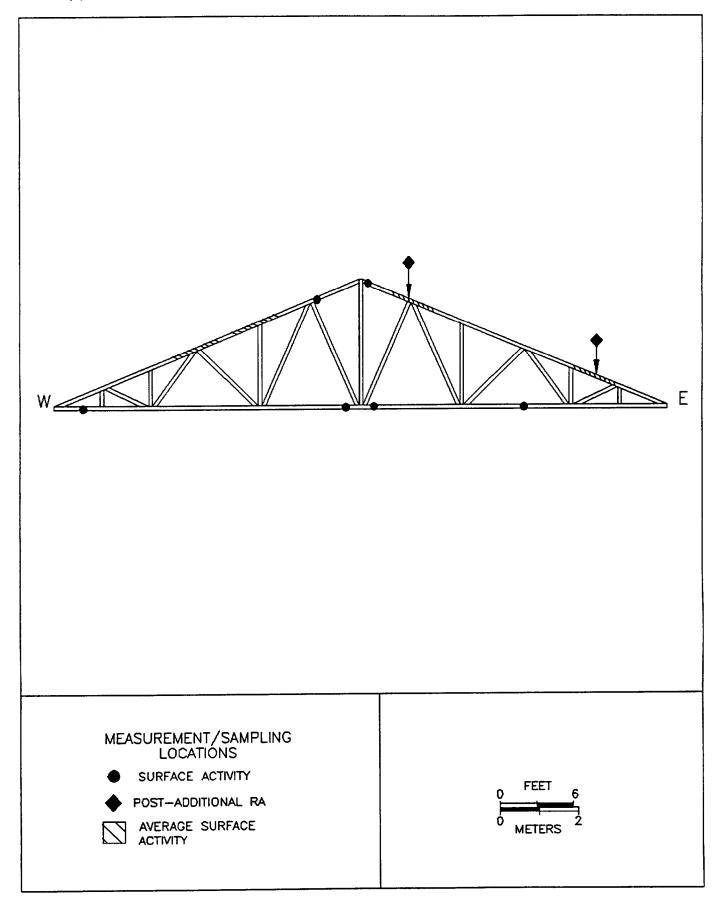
Building 3, Truss 5 — Measurement and Sampling Locations
